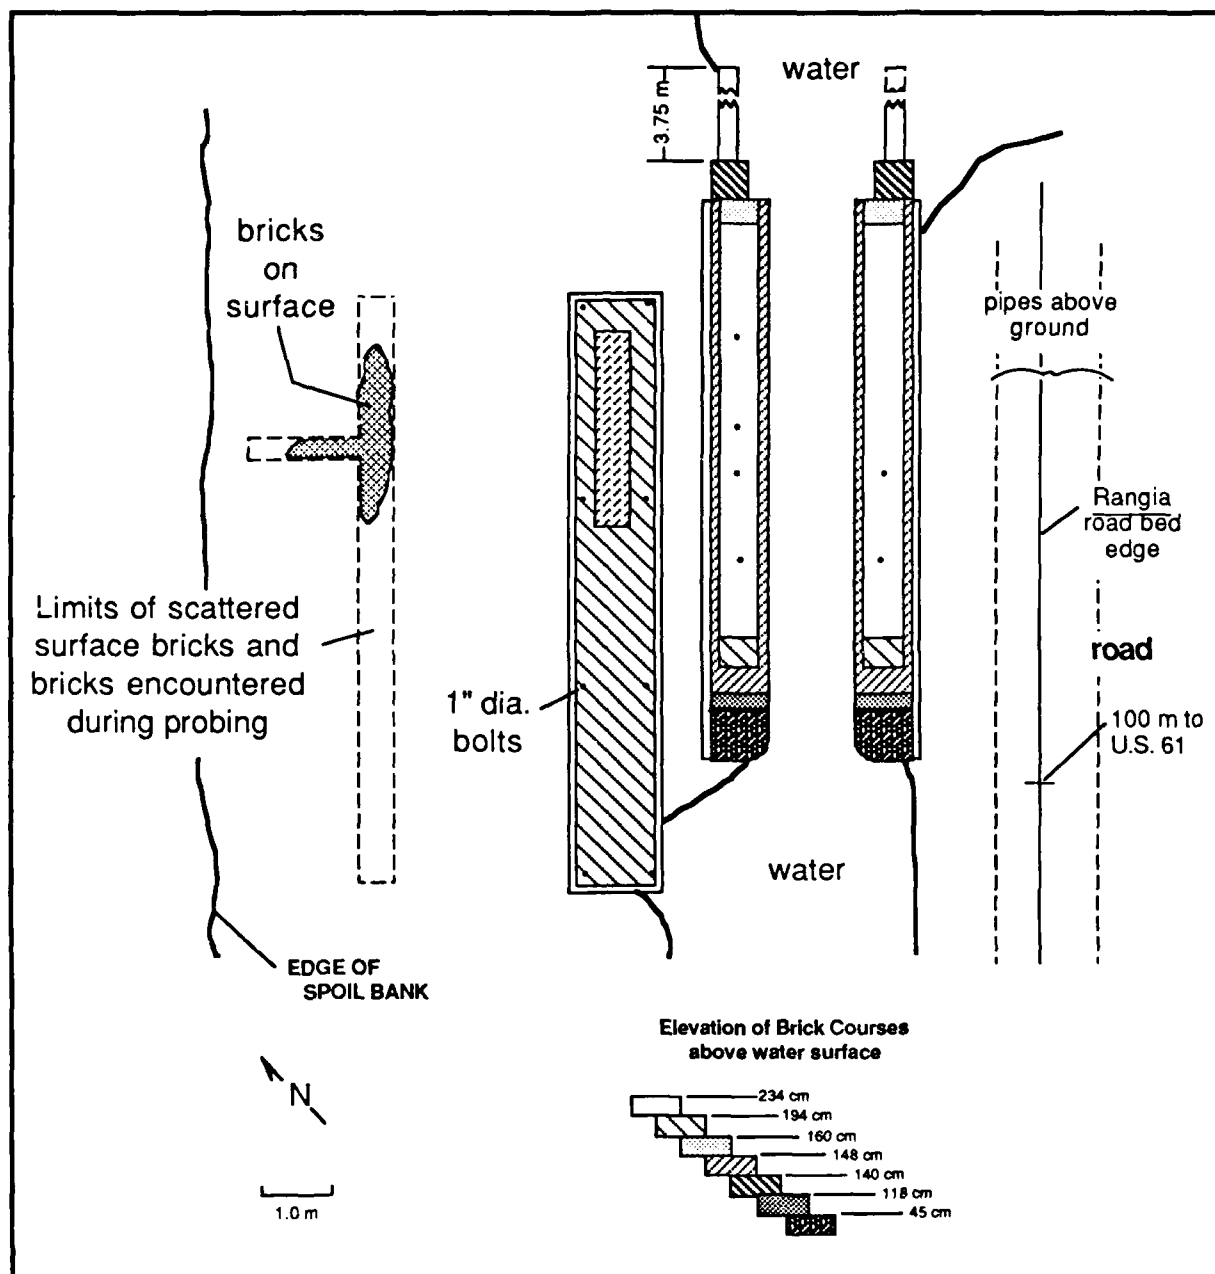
Plan view of the foundation remains of Prospect Plantation drainage machine.
